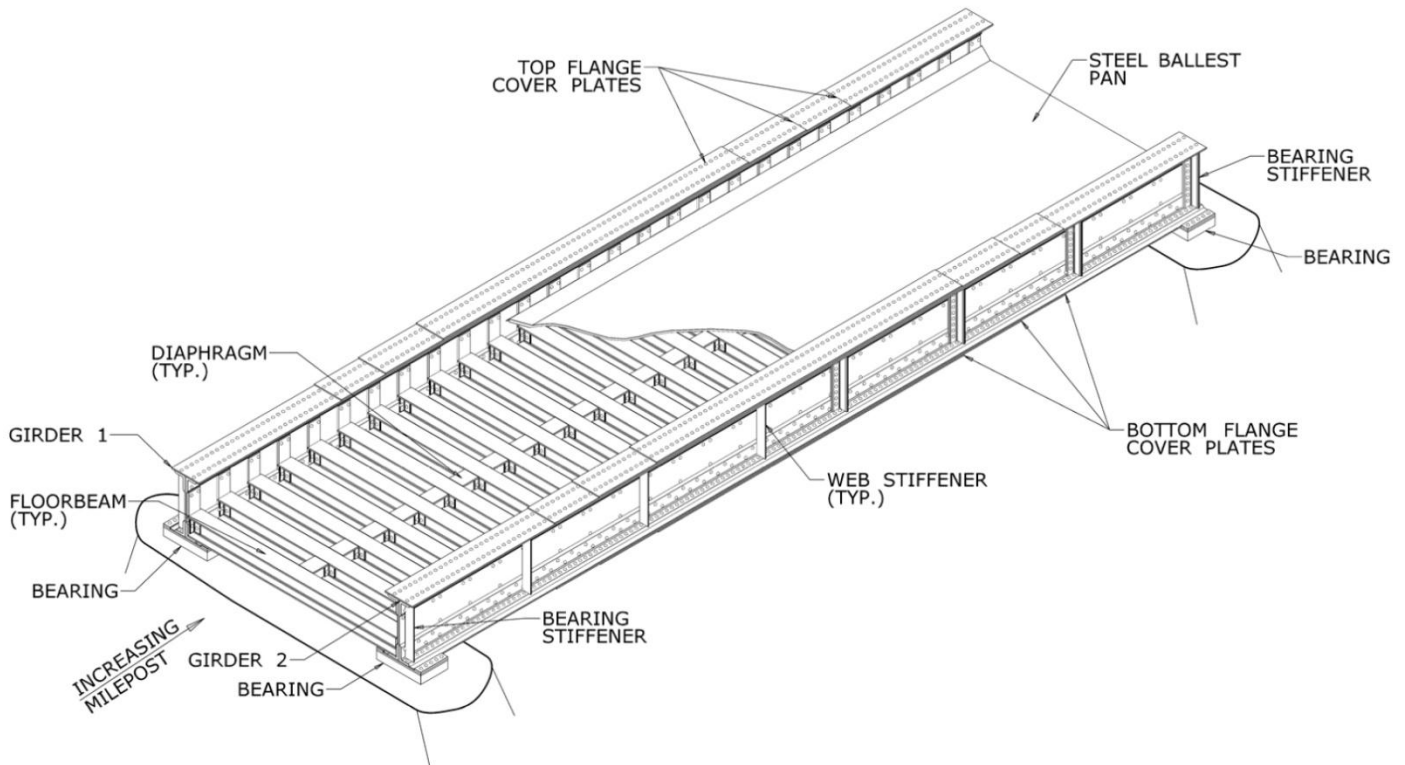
Through Plate Girder with a Stringer Floorbeam System from the top, with the track removed
